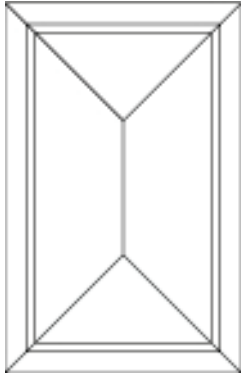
Cut 3D Object - Cut Walls to Roof Line - I
